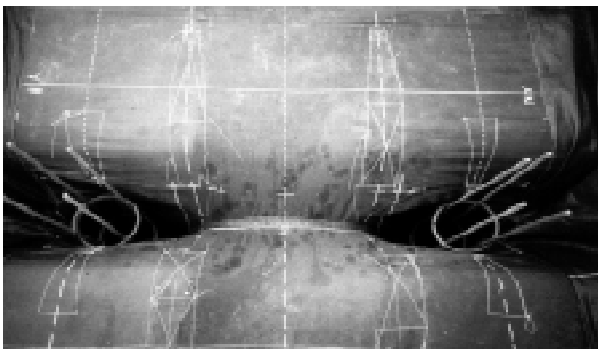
Photograph of slab-beam-column intersection in full scale test slab.
